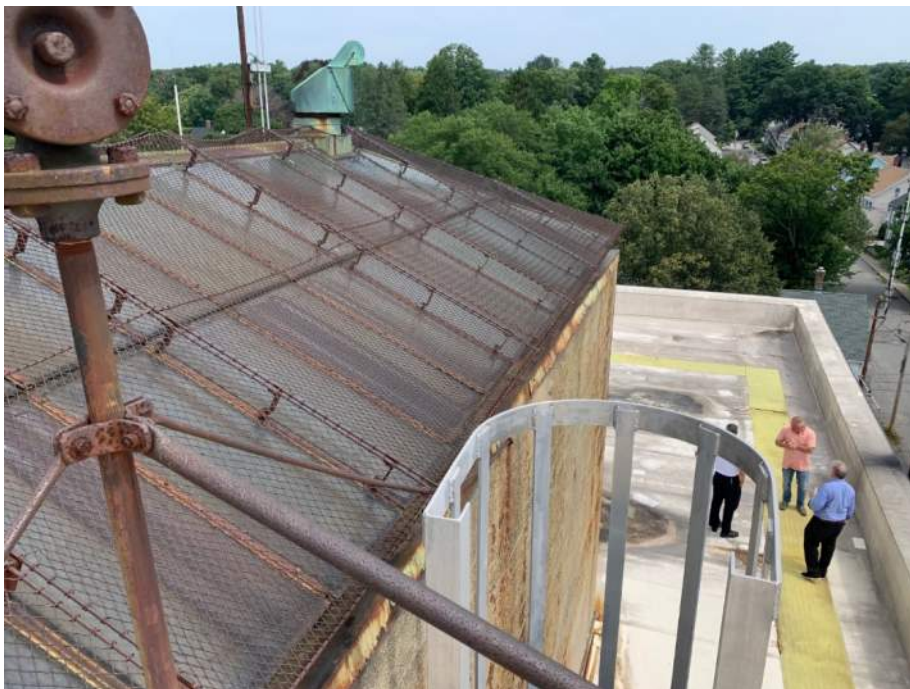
View of roof above freight elevator where some glazing is missing allowing water to infiltrate into elevator space. A new roof system will be required over the elevator enclosure.
